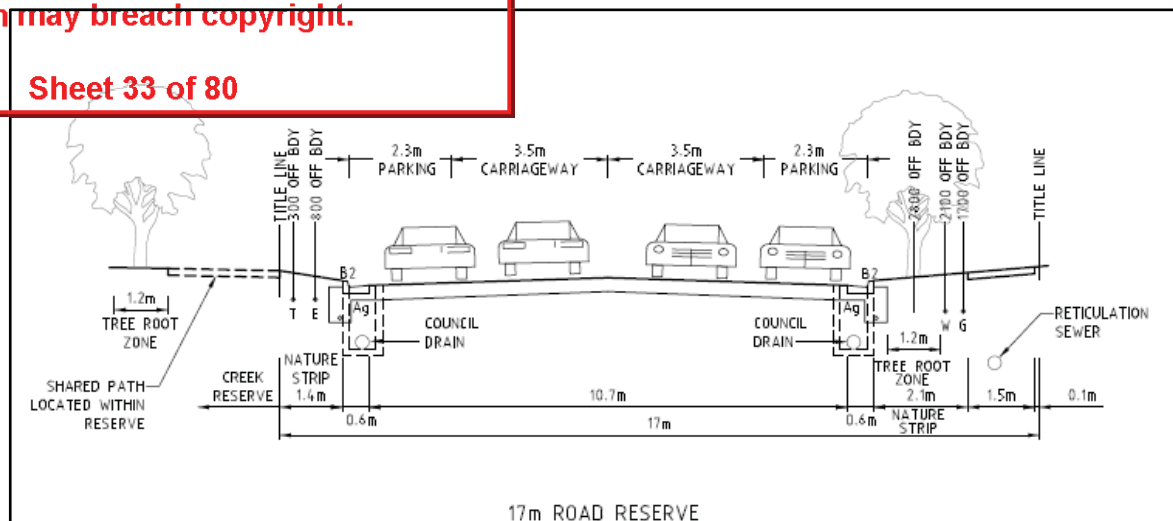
Entry Road Cross-Section (17 metre Collector Street Adjacent Open Space Reserve)
